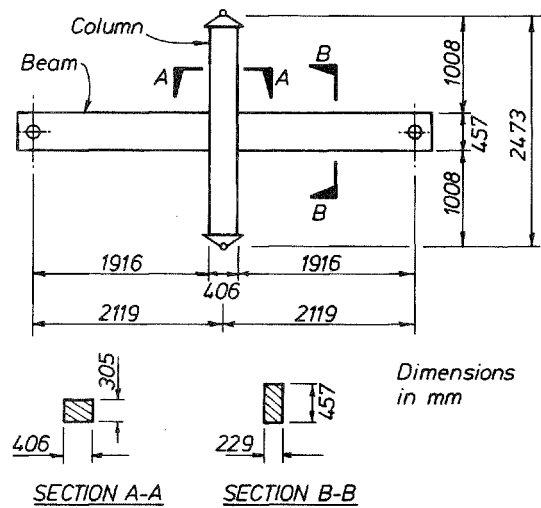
Dimensions of Beam-Column Test Units 1, 2, 3 and 4
